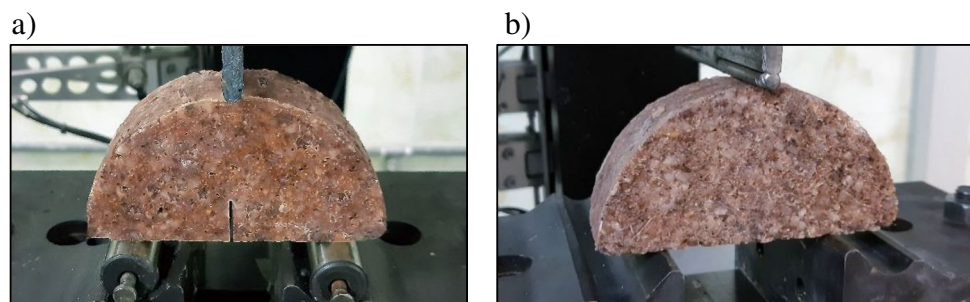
Examples of observed crack propagation of specimens; a pre-cracked SCB for fracture test, b un-cracked SCB for the tensile strength test
